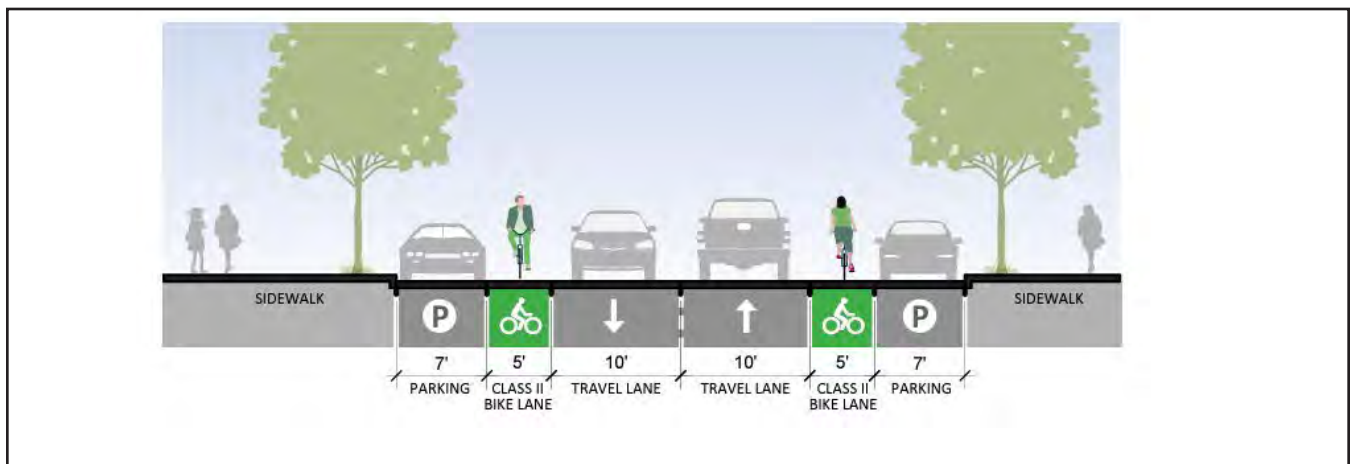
Pioneer Boulevard Cross-Section from SGL ROW to 500' of 183rd Street
